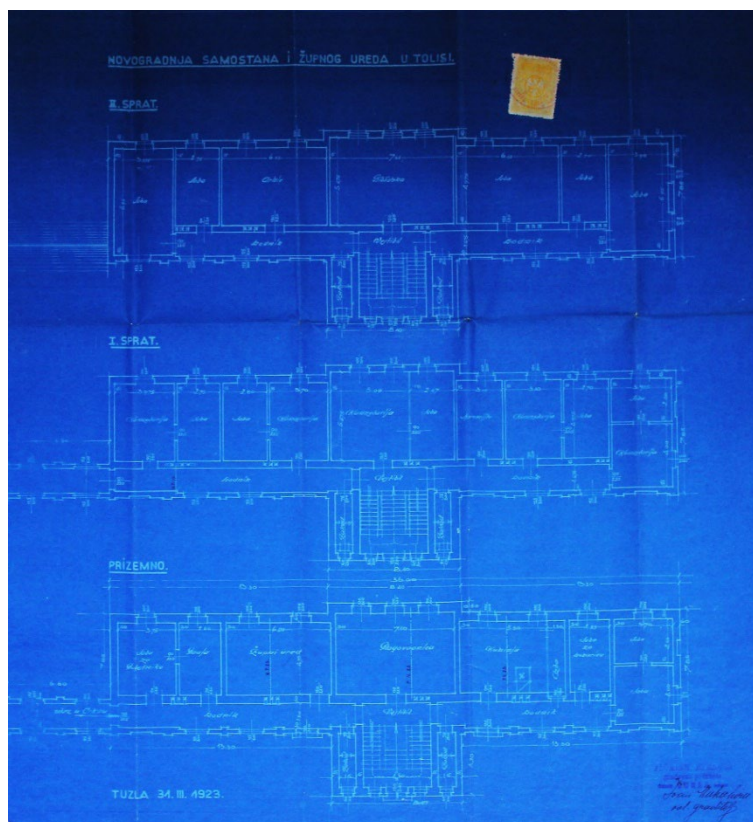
The Convent of the Assumption of Mary: floor plans of the ground floor and 1st and 2nd story, a segment of the project „New construction of the convent and parish office in Tolisa” done by architect Florian Strauss, dated 31st March 1923 [7]
